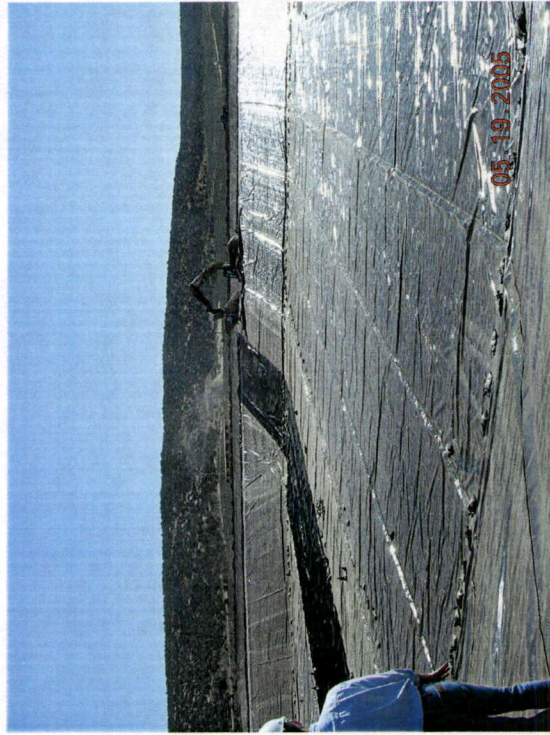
Secondary HDPE liner and geotextile being installed in the pregnant solution pond. Trackhoe working to lower pond overflow cut in the background.
